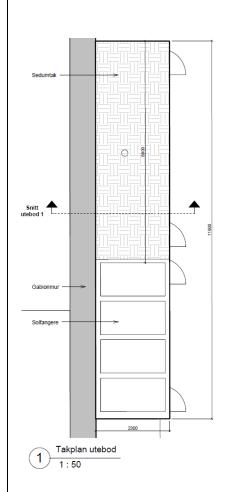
The roof of the store rooms with sedum roof and solar collectors. Source: Snøhetta
